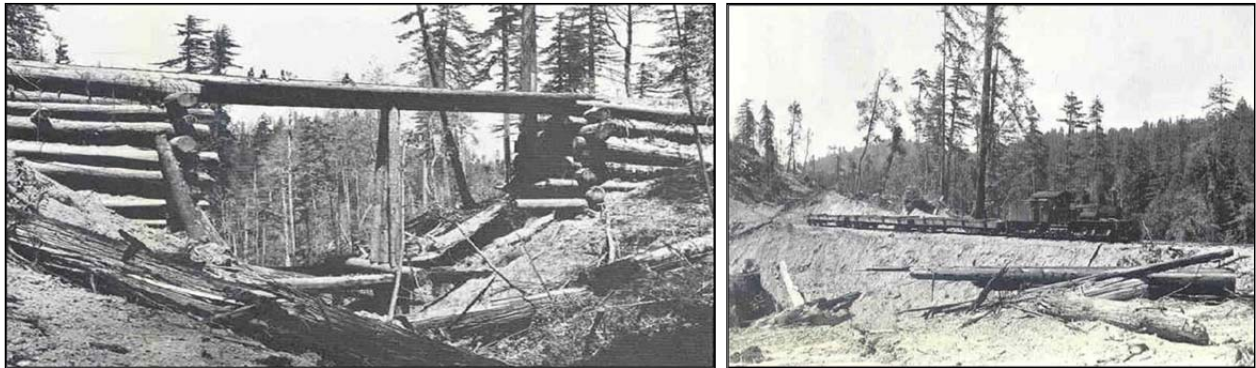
Rail crossings on Old Haul Road circa 1940s. Left Photo (A) shows trestle and possible crib log box culvert. Note the men sitting on top of the crossing. (Santa Cruz Lumber Company photo (1943)). Right Photo (B) is an example of large fill embankment. (Jack Gison photo (1947)). Both photos referenced in Dwight Ennis, <http://www.santacruzlumberco.com/index1.htm>
